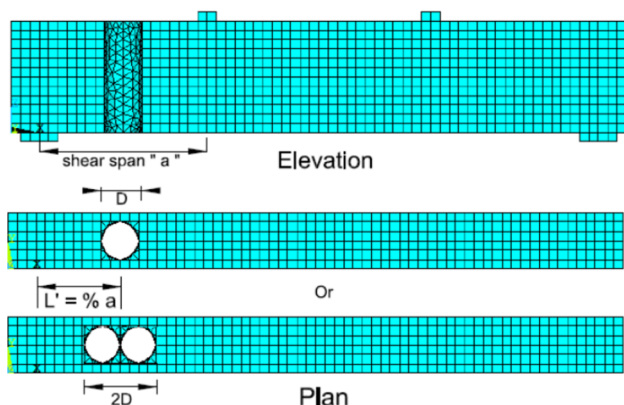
Numerical FE modeled RC beams with geometrical meshing, and details of the vertical circular openings.
